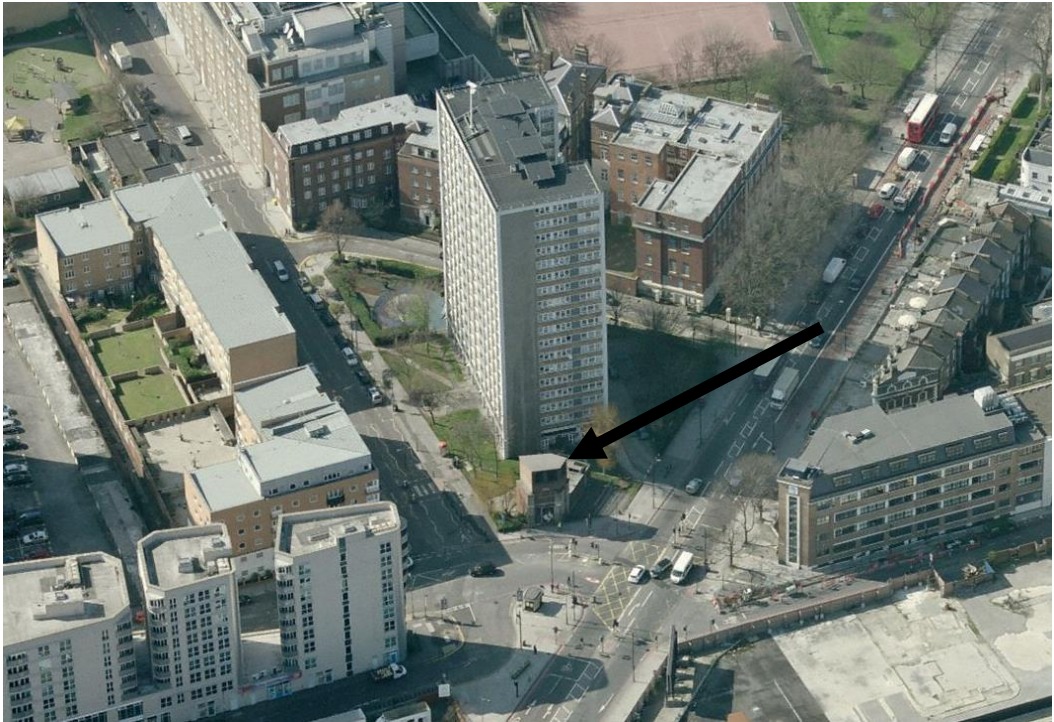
Aerial photograph showing the eastern elevation of Kestral House and the existing ventilation shaft building.
